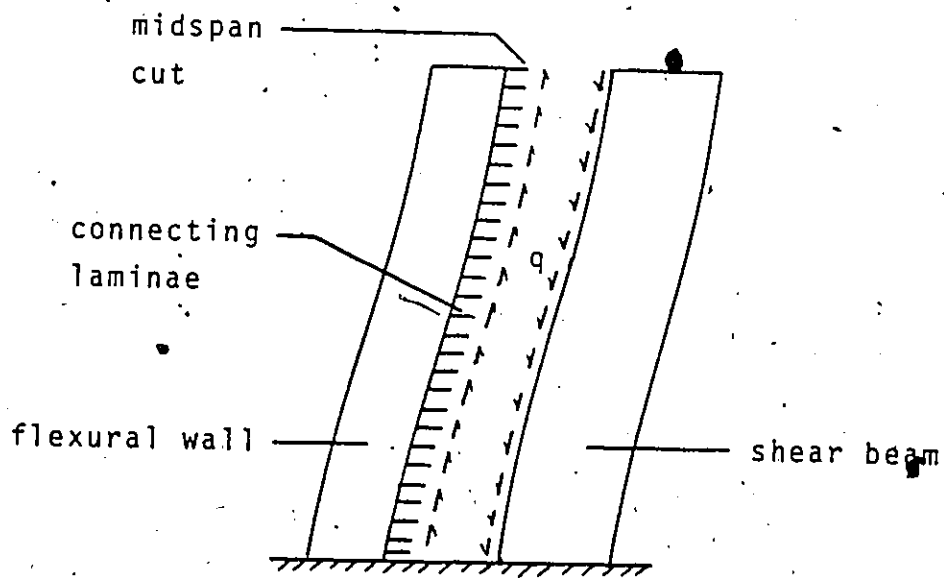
DISTRIBUTED SHEAR IN CONNECTING LAMINAE
